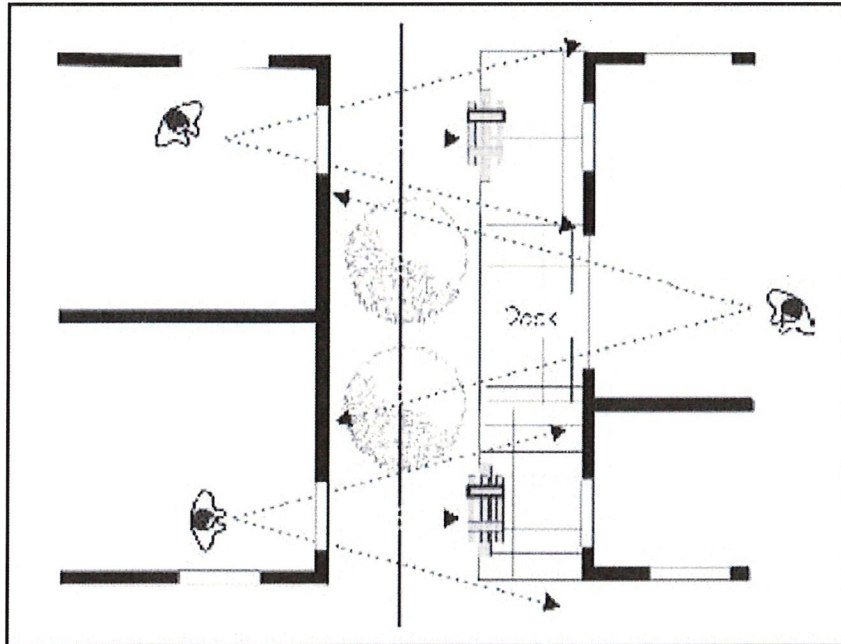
Offsetting window locations will help prevent views into adjacent houses.
